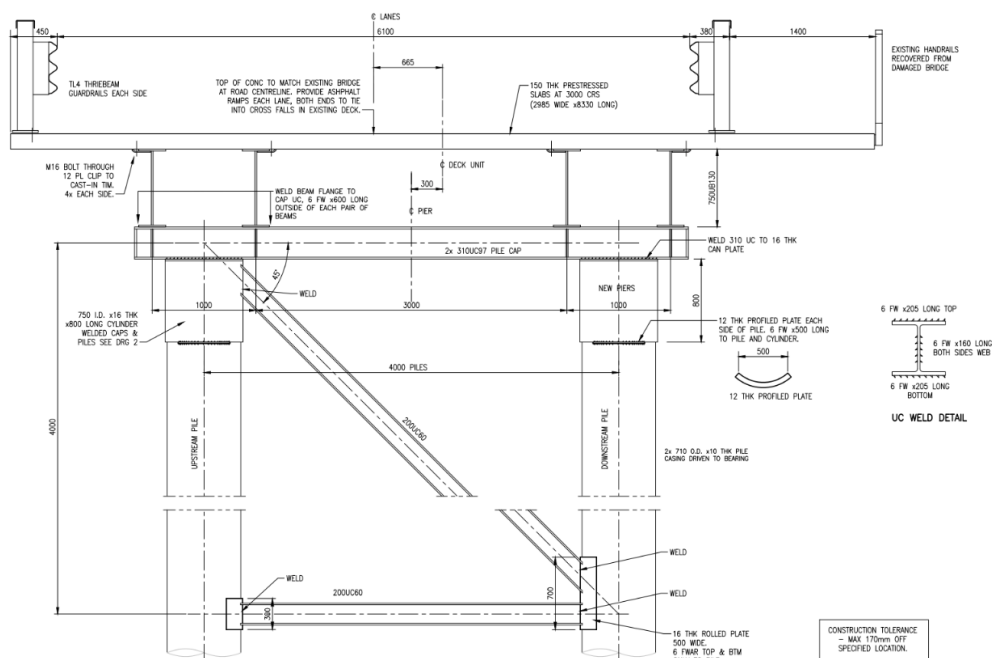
Temporary Staging Cross Section of Redclyffe Bridge
